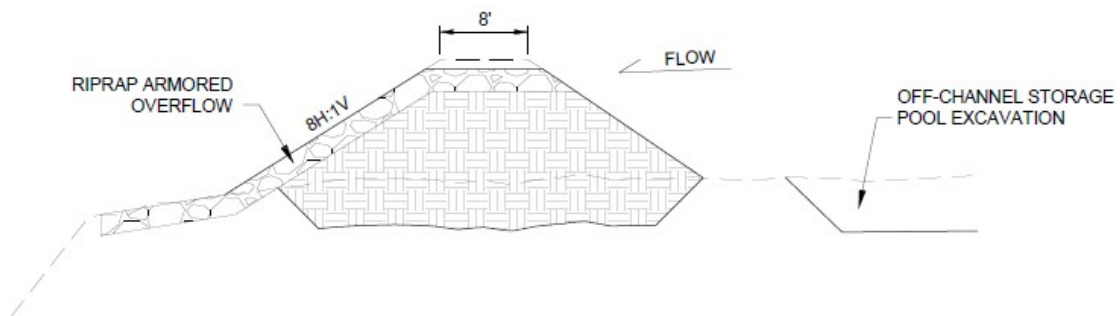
Typical Dam Diversion Extension Overflow Crest Section
